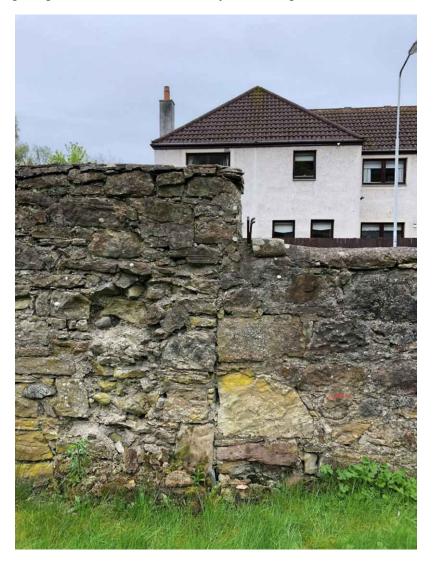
View of #6 Verre Park from behind south boundary wall. Development has shown no contextual or sensitive design to the visual amenity of the Listed Building and has set the principal for new development scale and mass along Main Street.
